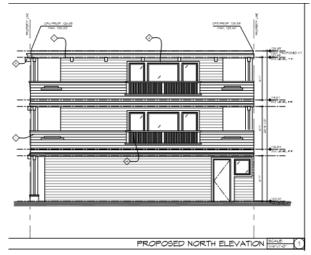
Proposed north façade of new building facing the rear of the bungalow. Source: A3.11, Peha & Associates Architecture, December 21, 2017.
